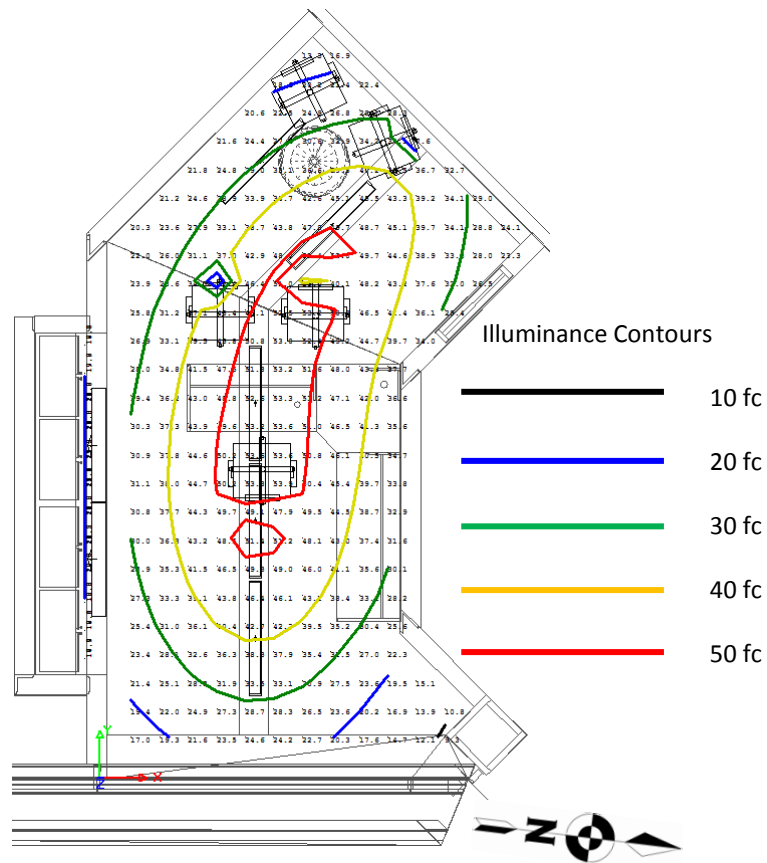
Office Plan Illuminance Contours, plan NTS
